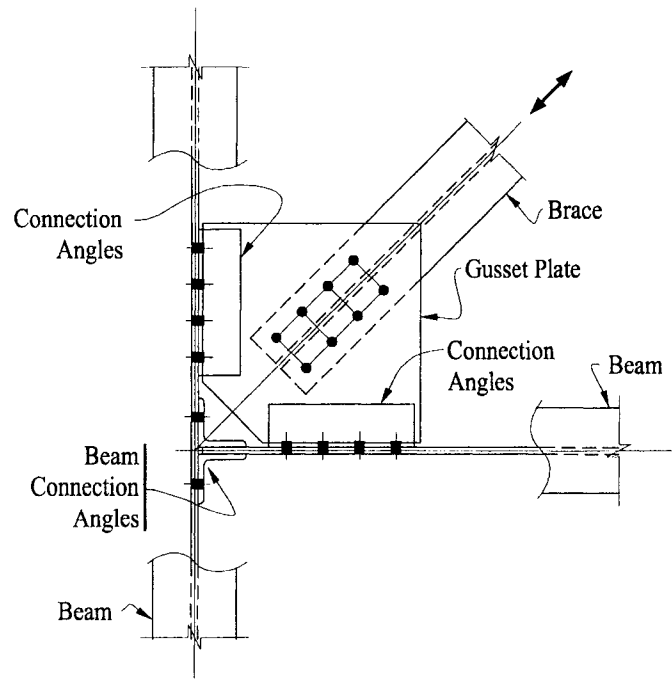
Horizontal brace connection at beam-to-beam intersection.
